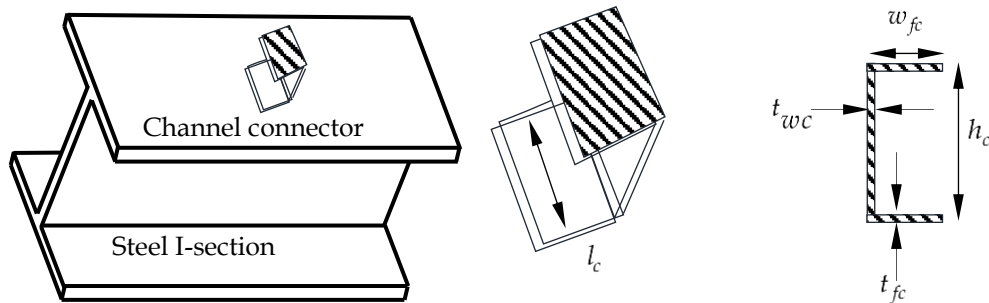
Chanel shear connector welded over steel-section and typical geometric details
